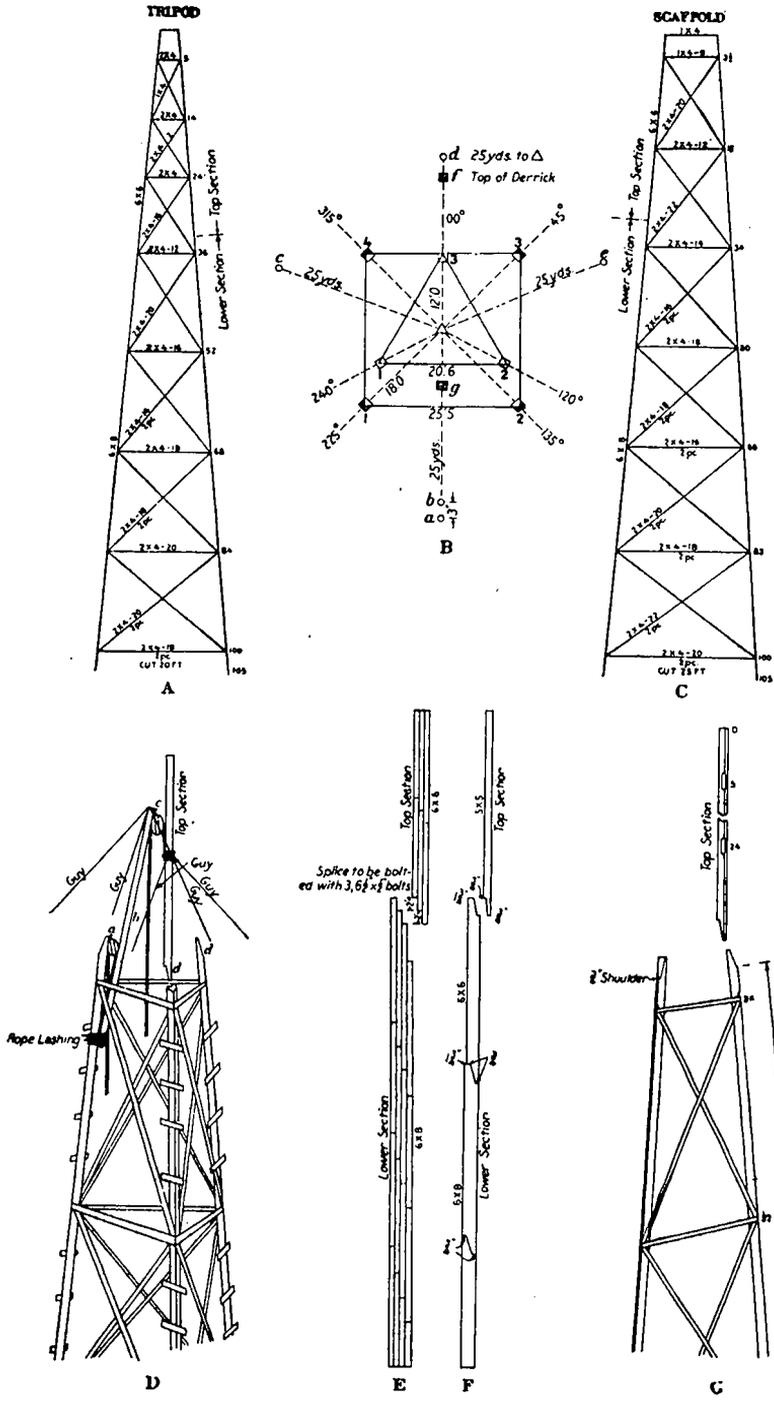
Working drawings for 100-foot signal showing arrangement of tackle for raising top section of tripod.
